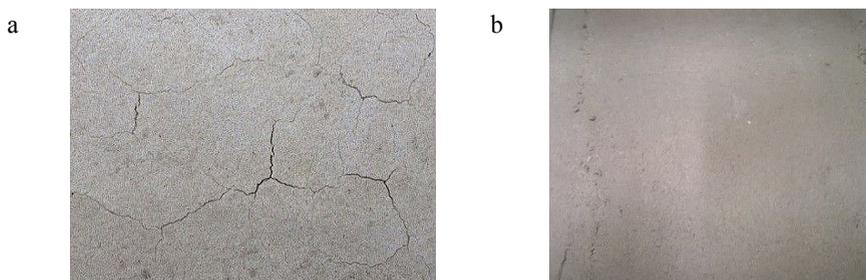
Details of surface of samples (a - author's photo) with cracks, (b - author's photo) without cracks.
